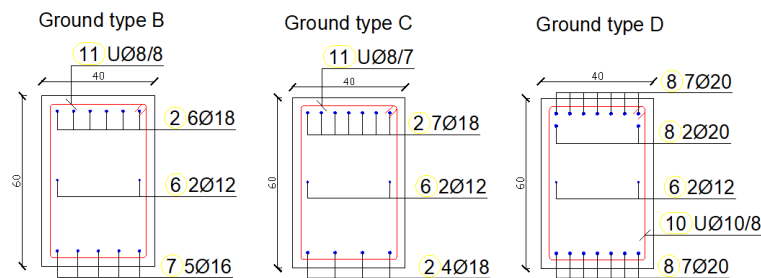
Adopted reinforcement in beams G_1 and G_2 in considered cross-sections
